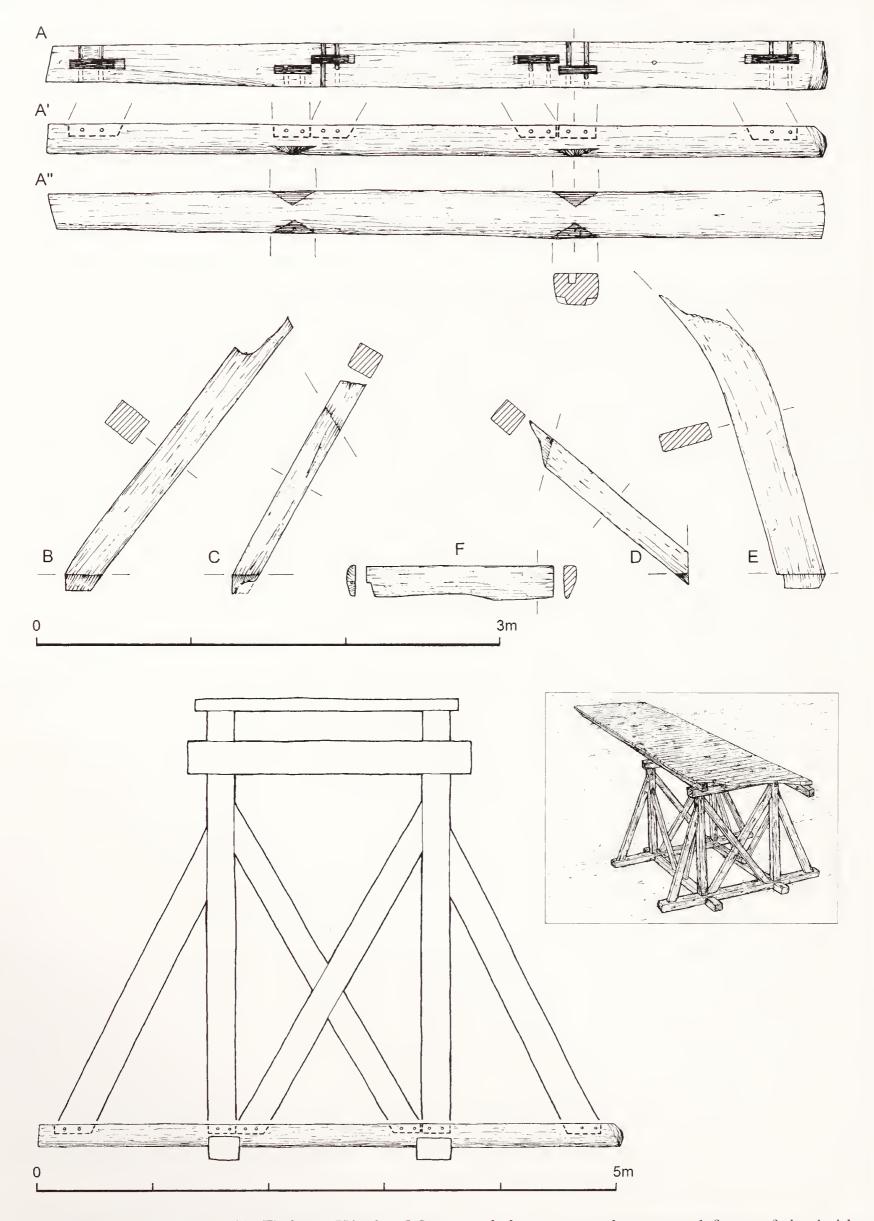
The bridge timbers (A–F) from Kinsley Moat, and the suggested structural form of the bridge (drawing by Jon Prudhoe).
